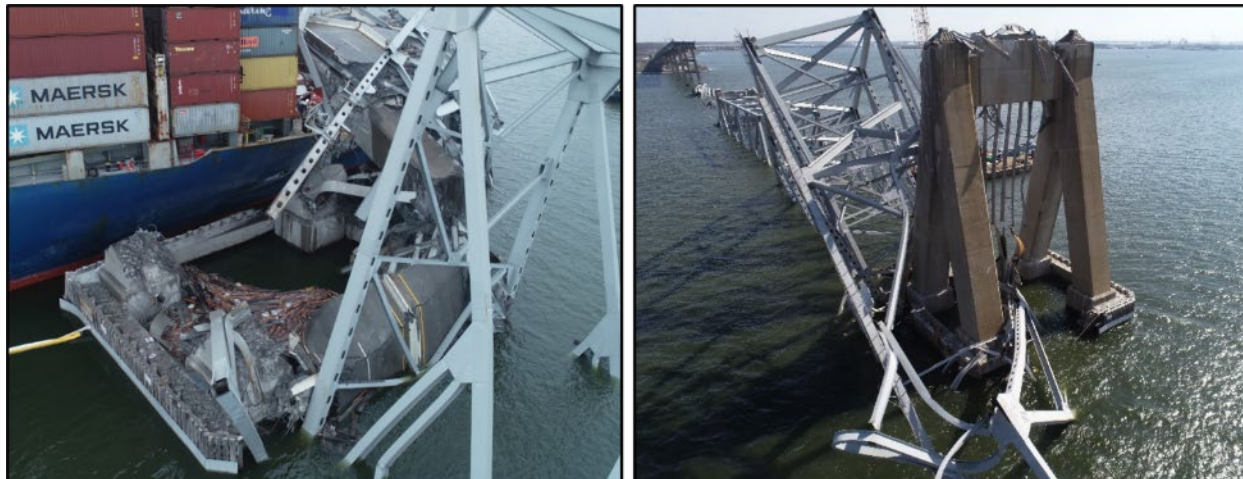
Left to right: Damage to fendering surrounding Pier 17 and Pier 18.
